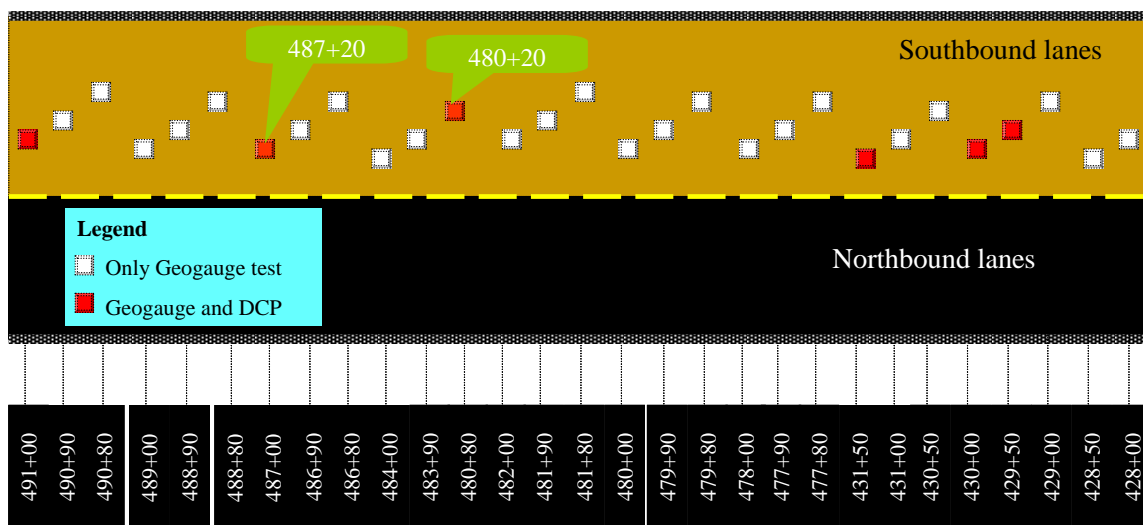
Test Point Layout Along the Crushed Stone Base Section of SR-53 New Construction at Fremont, Ohio
